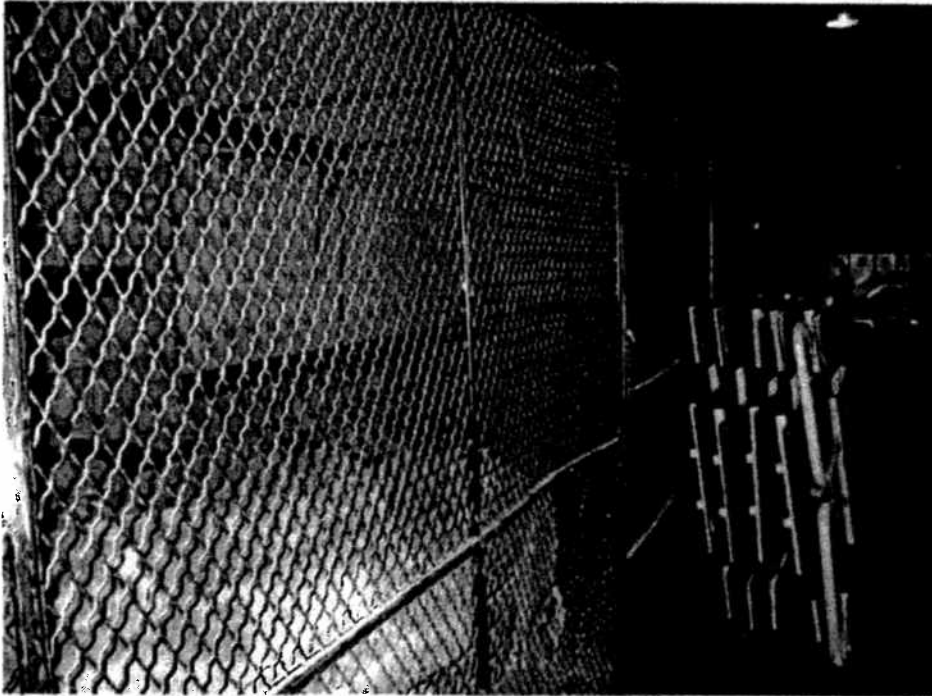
Close-up view looking south of the chain link storage area at east end of the drill floor.
